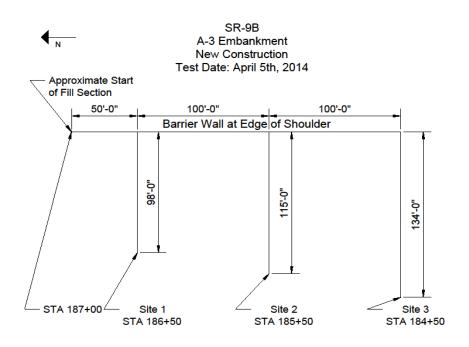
Project Site #3 SR-9B - Test site location sketch
